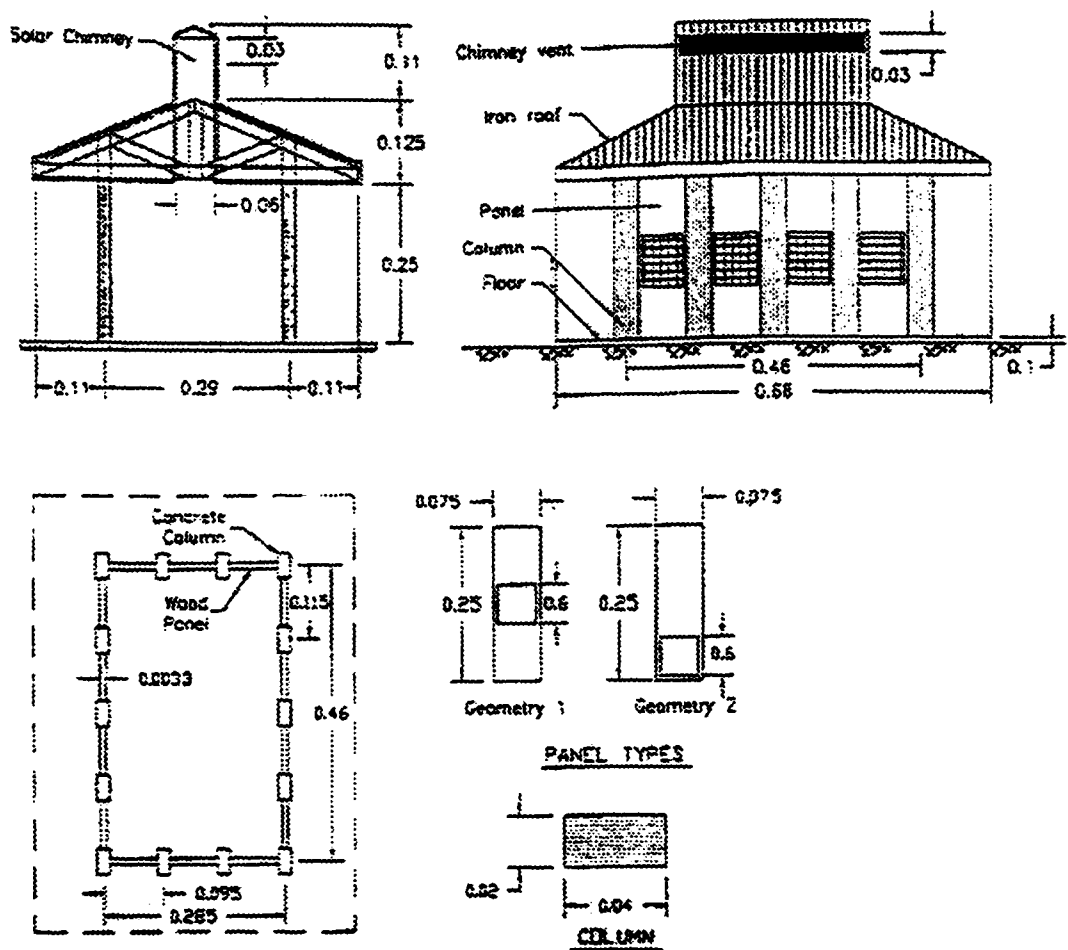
Model building details and dimensions (from Barozzi [3]).
